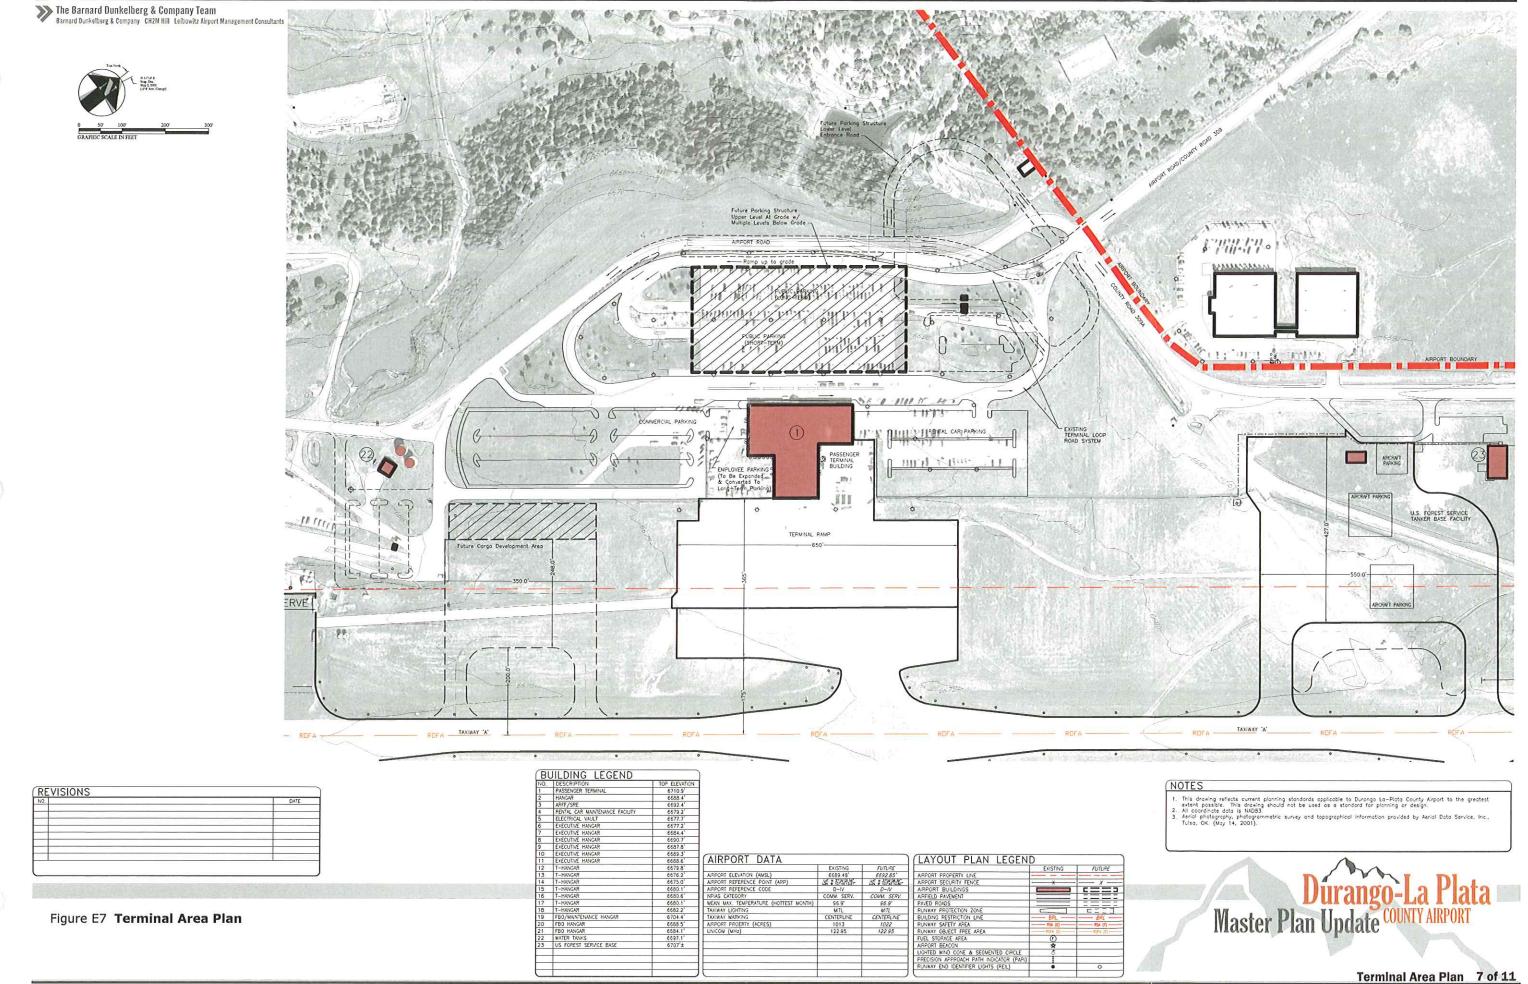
, E8, and E9 entitled TERMINAL AREA PLAN, GENERAL AVIATION PLAN/SOUTH, and GENERAL AVIATION PLAN/NORTH, present a detailed view of the proposed landside development areas along the west side of the airport. This development area was also depicted on the previously presented AIRPORT LAYOUT PLAN.
